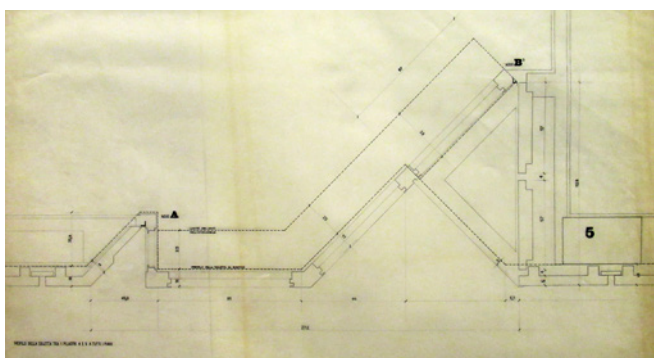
Profile of the floor between pillars 4 and 5, with the “Silipol” panels on both the sides of the openings, 1:5 scale. (CASVA, AA archive collection, drawing no. 3776).
